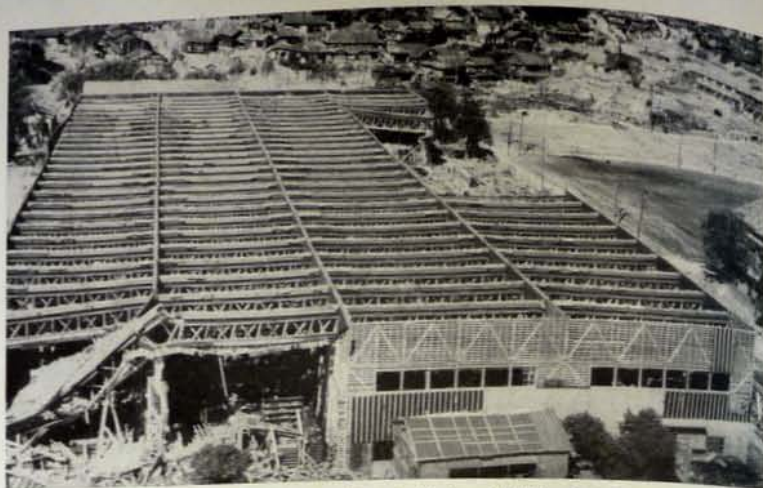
9,500 feet from GZ. Group 50. Aerial view of Building 2, looking northwest.
